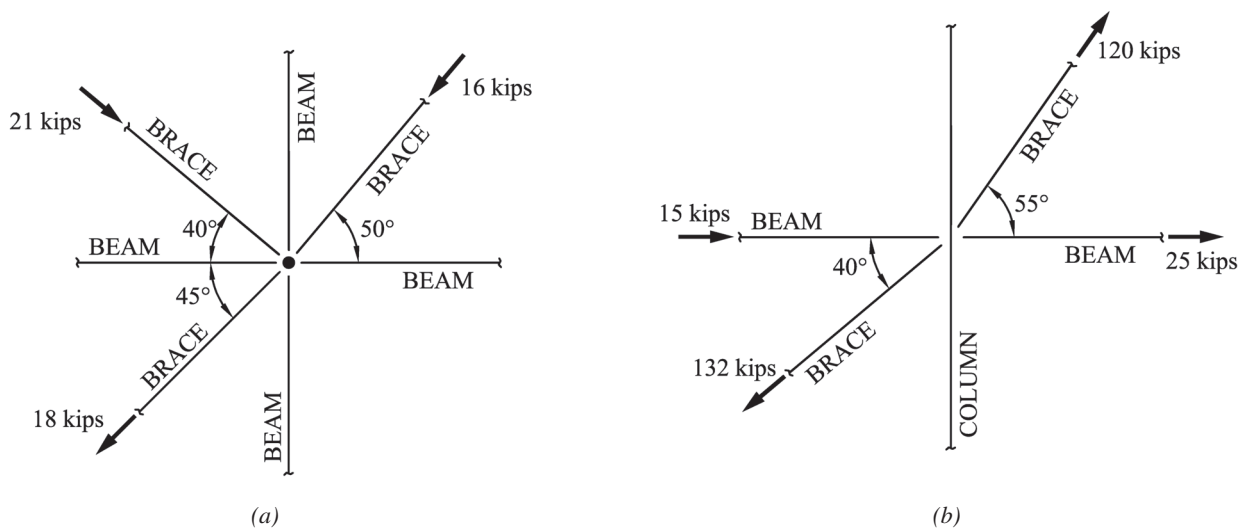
Partial structure for Example 2. (a) Plan. (b) Elevation.
